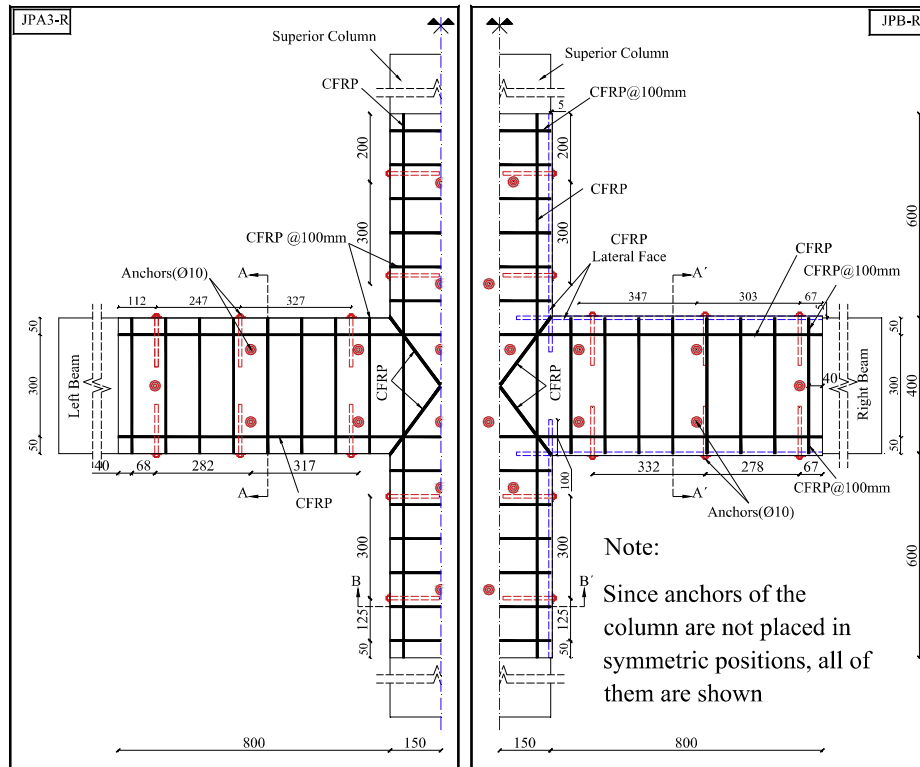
Details of the schemes used for the retrofitting of the damaged specimens (dimensions in mm).
